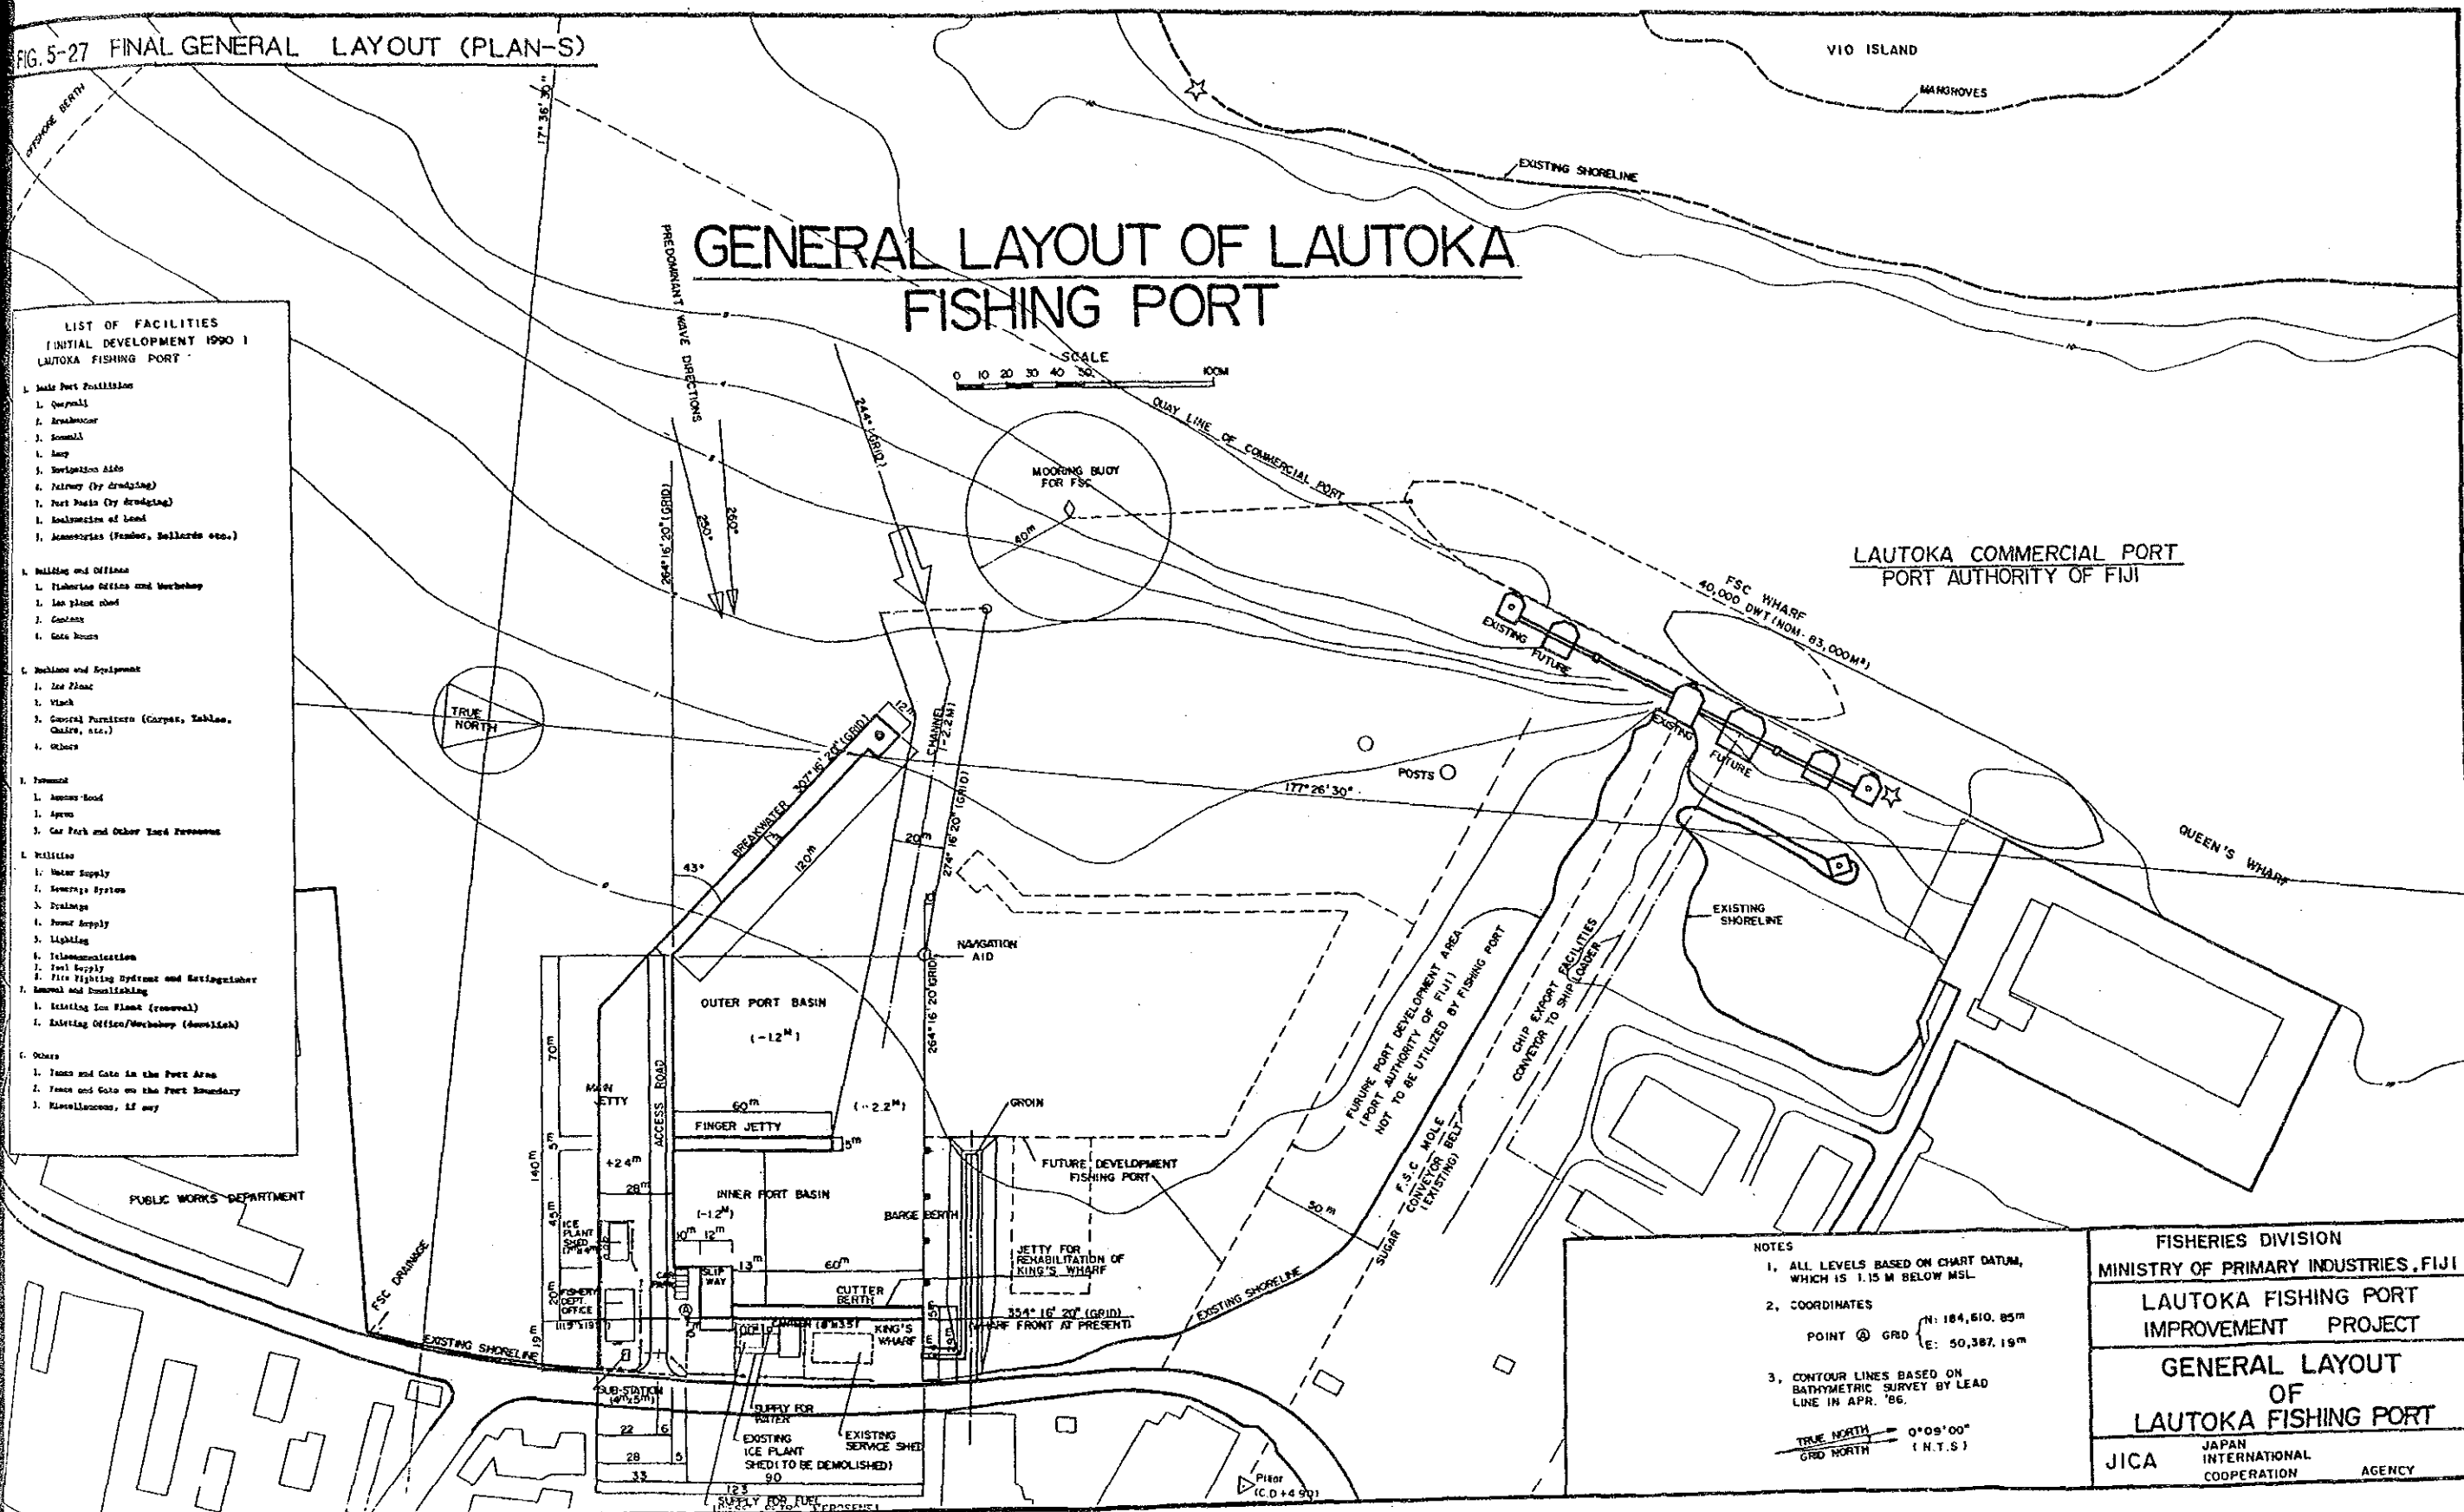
FINAL GENERAL LAYOUT (PLAN-S)
